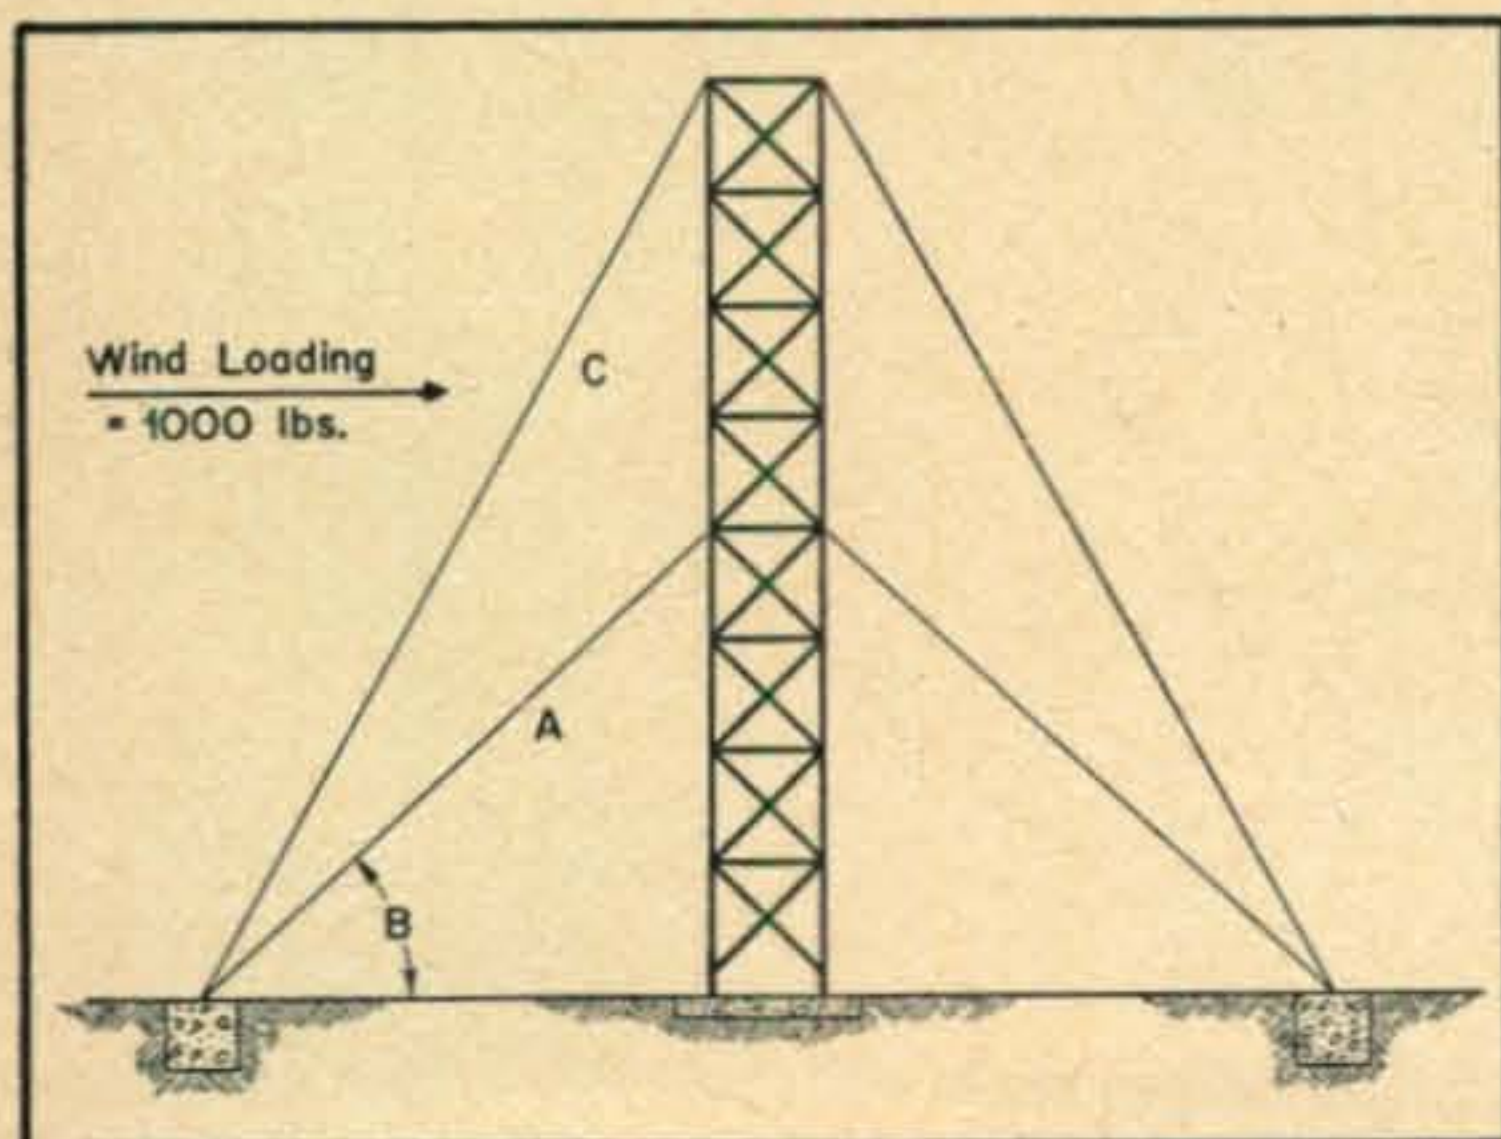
, showing wind loading, anchorage, and guying on a 50-foot tower. Explanation is in text.
